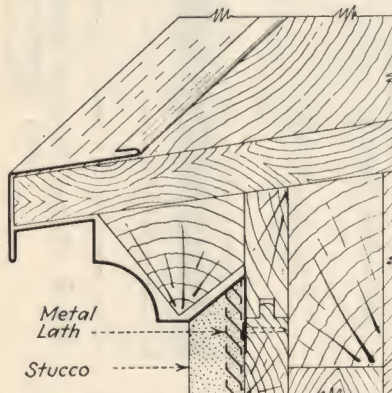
MOLDING UNDER EAVE TO STUCCO WALL
